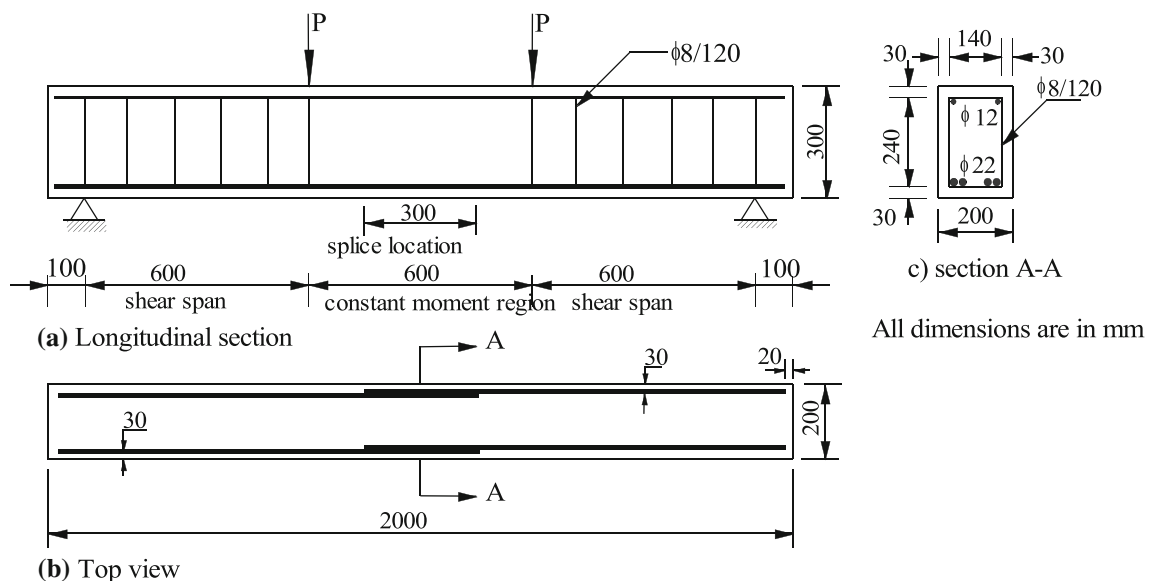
Longitudinal and cross-sectional details of the test specimen and loading position
